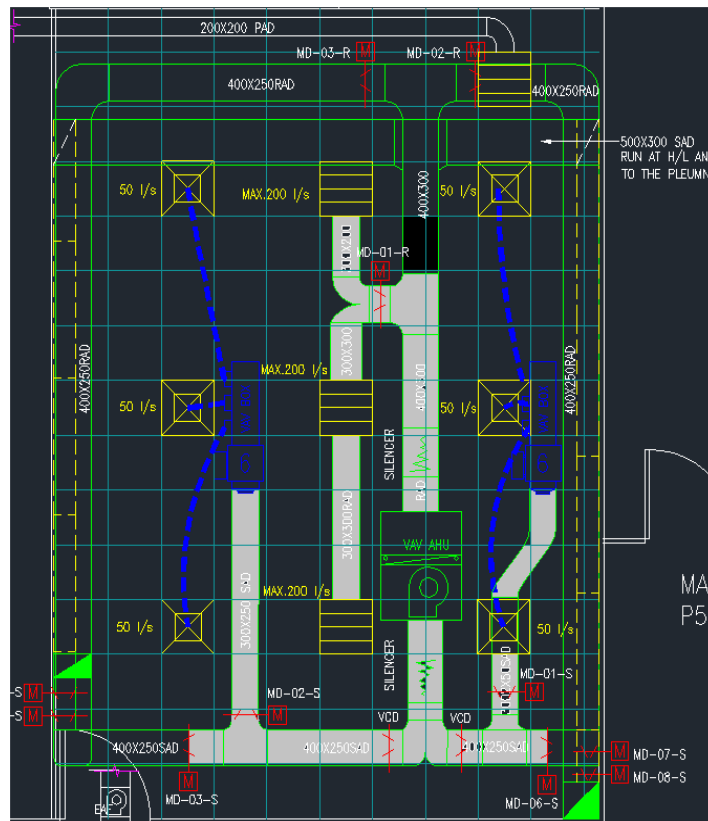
(b) Ductwork and diffuser layout plan of Mixing Ventilation
